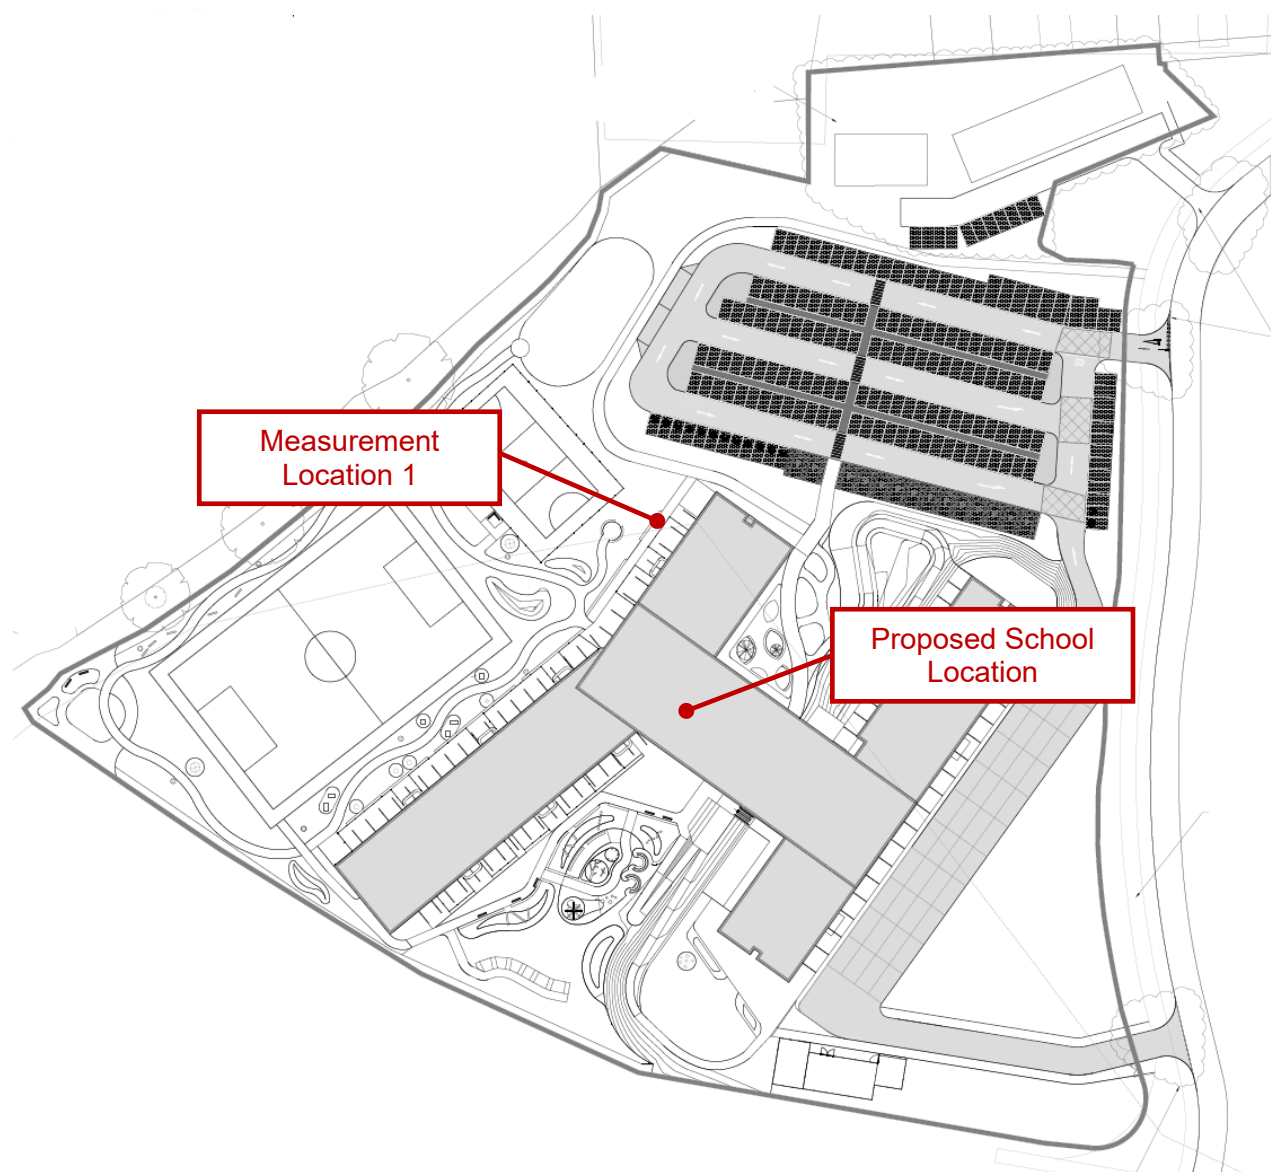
SITE LOCATION SHOWING KEY LOCATIONS
